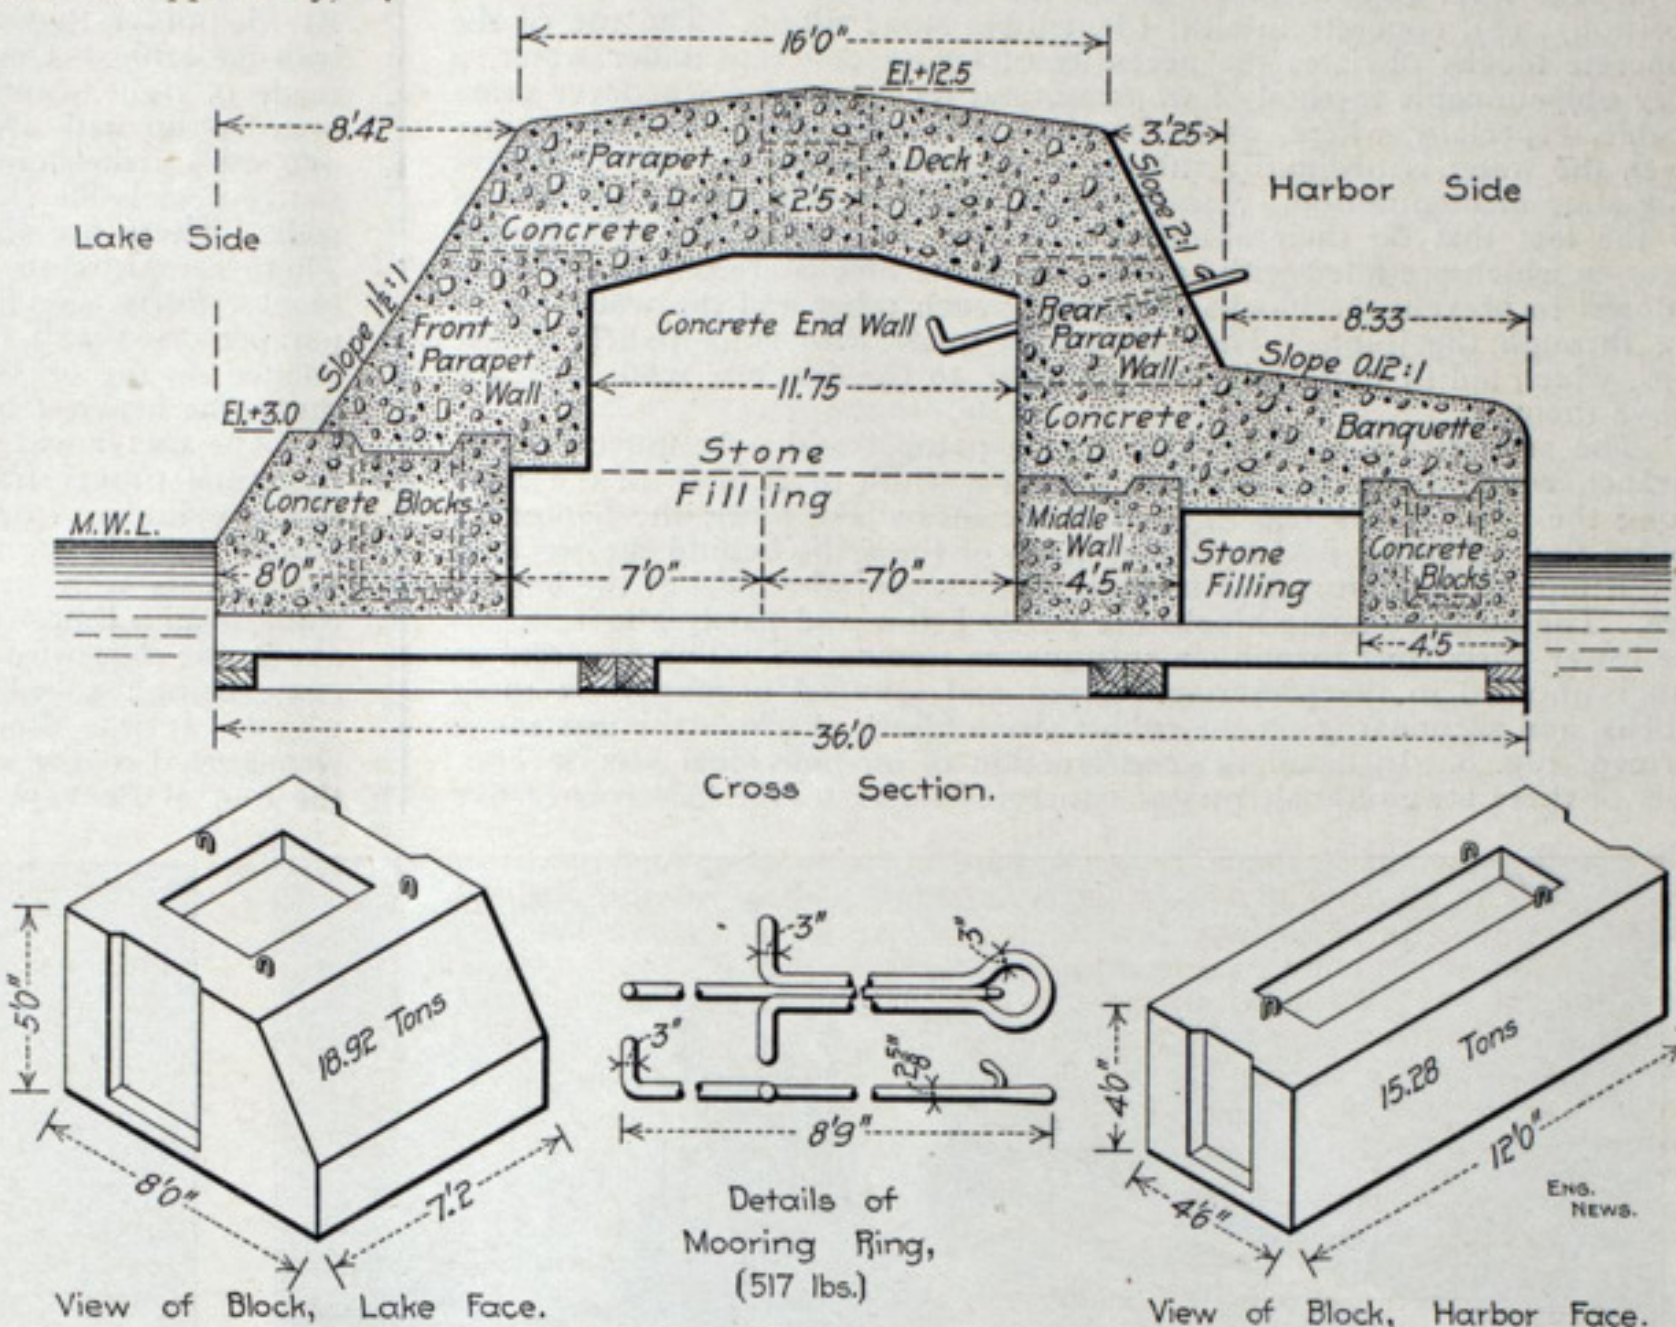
Typical cross-section of concrete shell breakwater for replacing timber superstructure wrecked by storm at Buffalo, and isometric views of face blocks.
